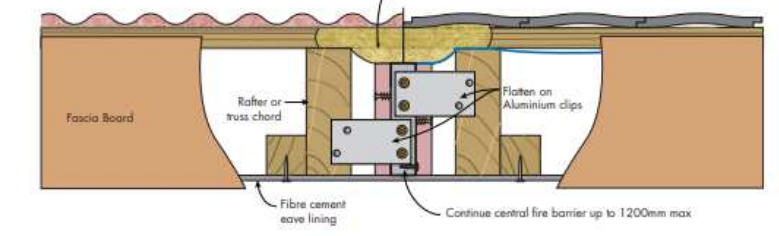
Interhome over Eave End Detail for Class 2 Buildings
